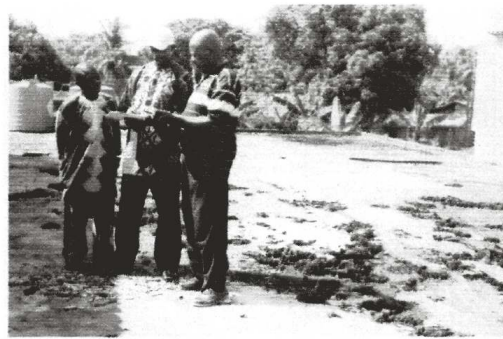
Members of Staff of Civil Engineering Department carrying out undestructive test on Roof Slabs of Workshops 1 - 4 to determine the concrete strength
